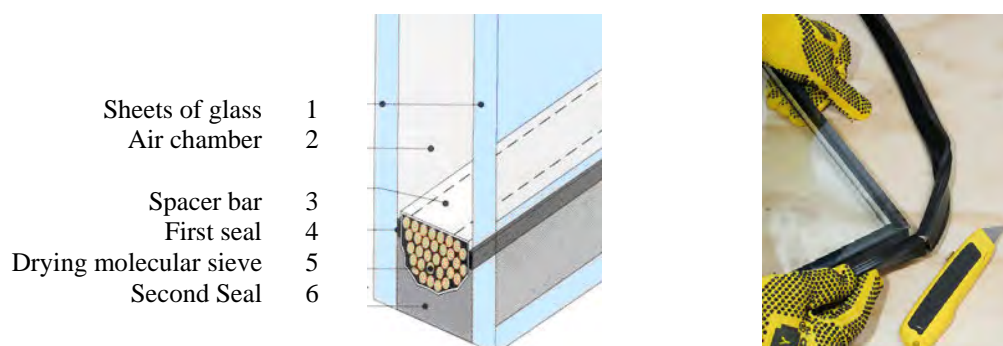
Detailed view of glazing with an air chamber and the process of removing a seal
